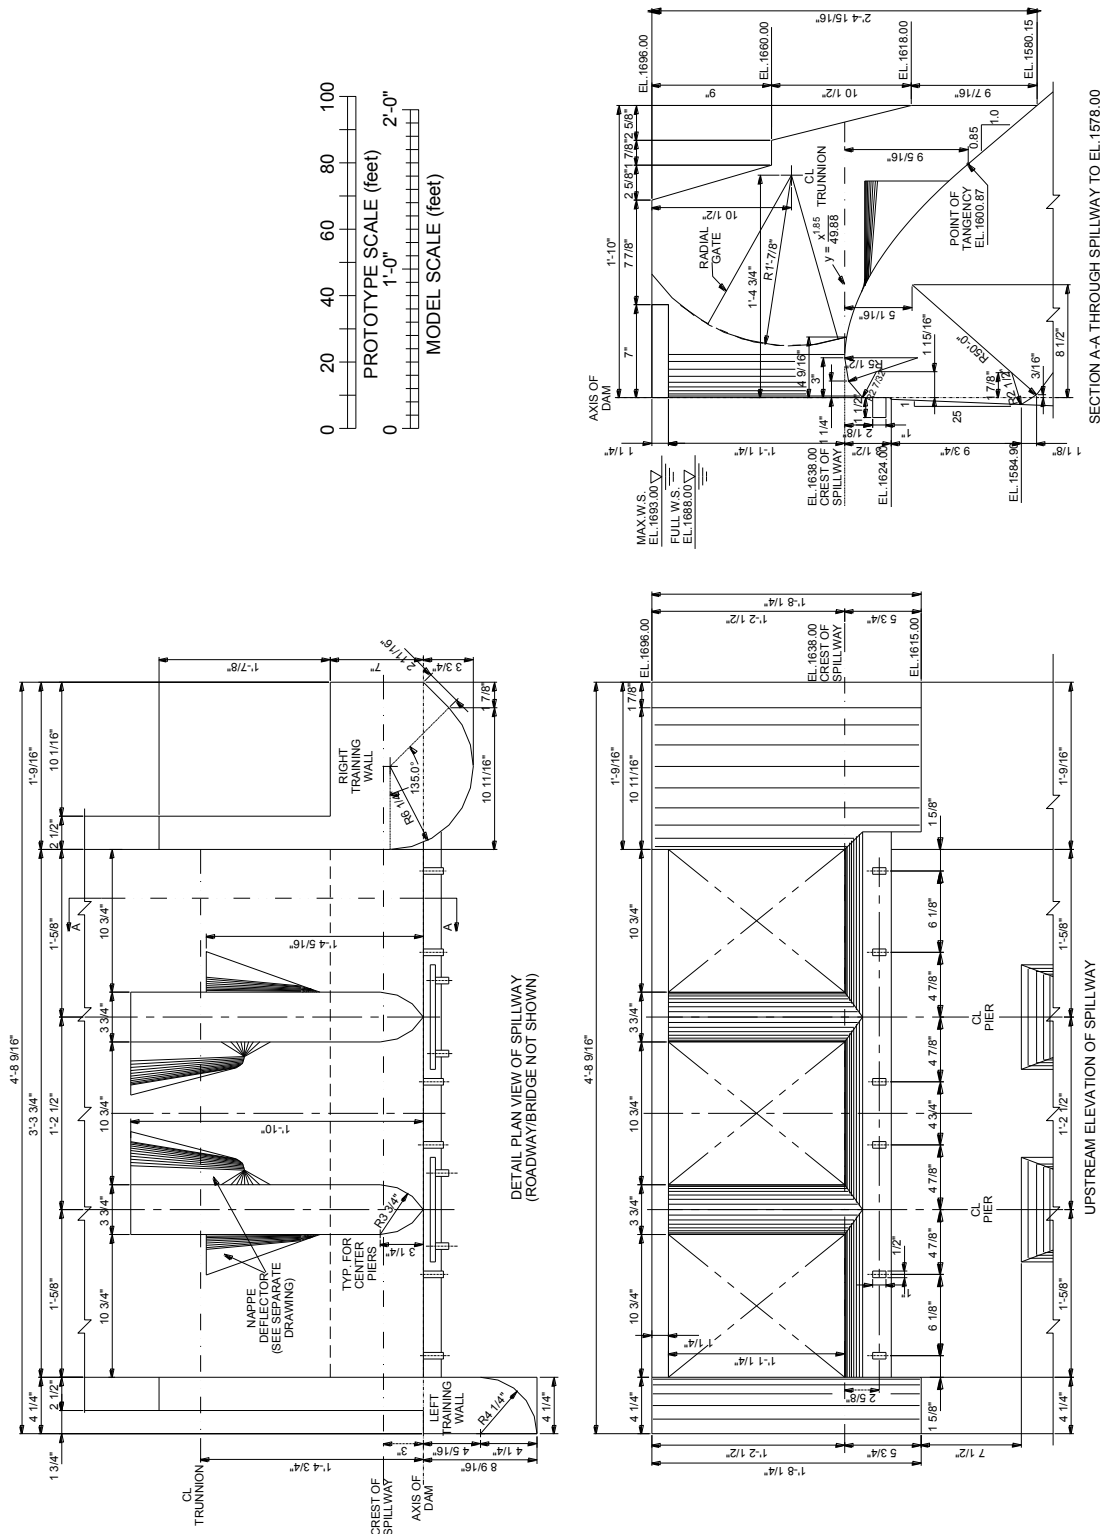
Plan, Elevation, and Section of Spillway Above El. 1578.0 for 1:48 Sectional Model
